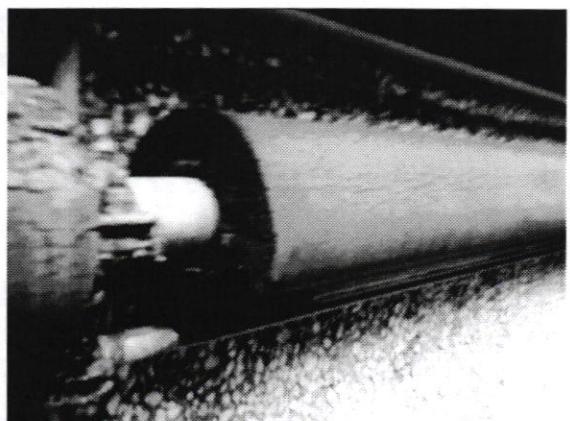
View of HA No. 31 – fire stop caulk located above the ceiling deck in the pharmacy building (ND)
